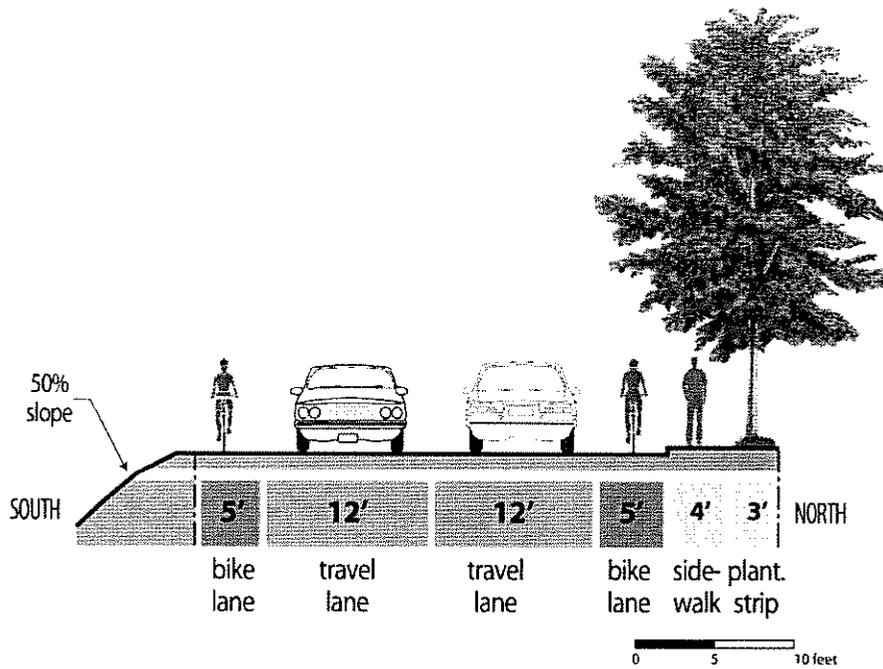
Section of Proposed Improvements for Project 4: SFD (Olema Road (east) to Claus Drive): SFD west of Azalea Avenue
